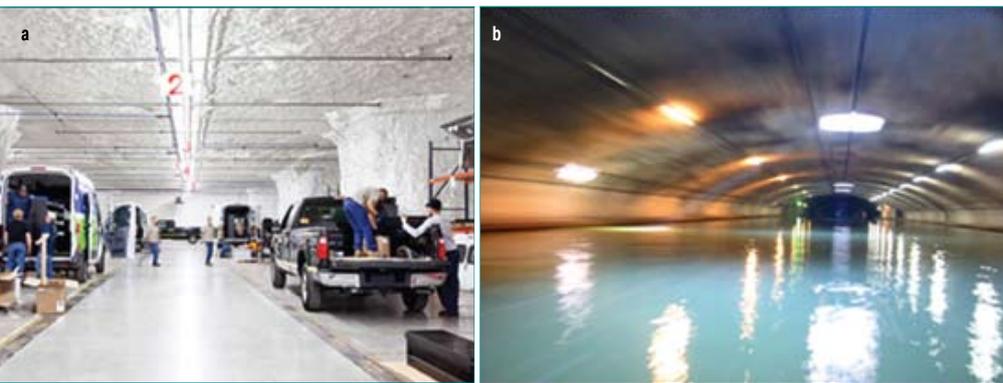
Multi-purpose structures: a – frozen food storage; b – reservoirs of drinking water
